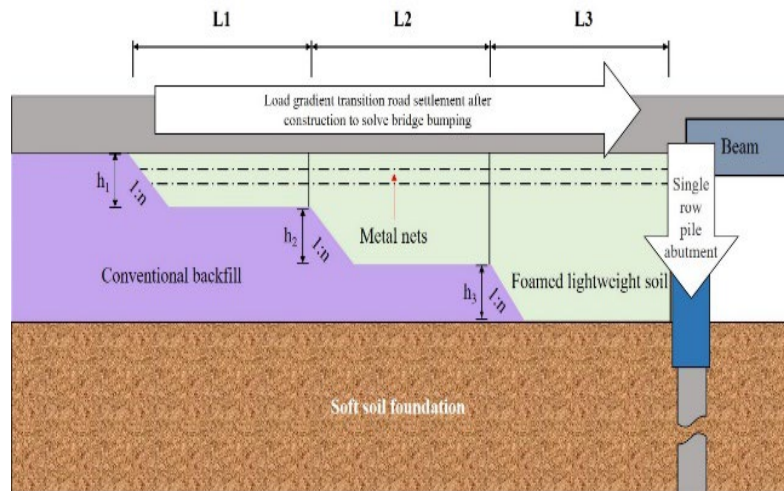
Foamed lightweight soil backfill in bridge and culvert transition section.
